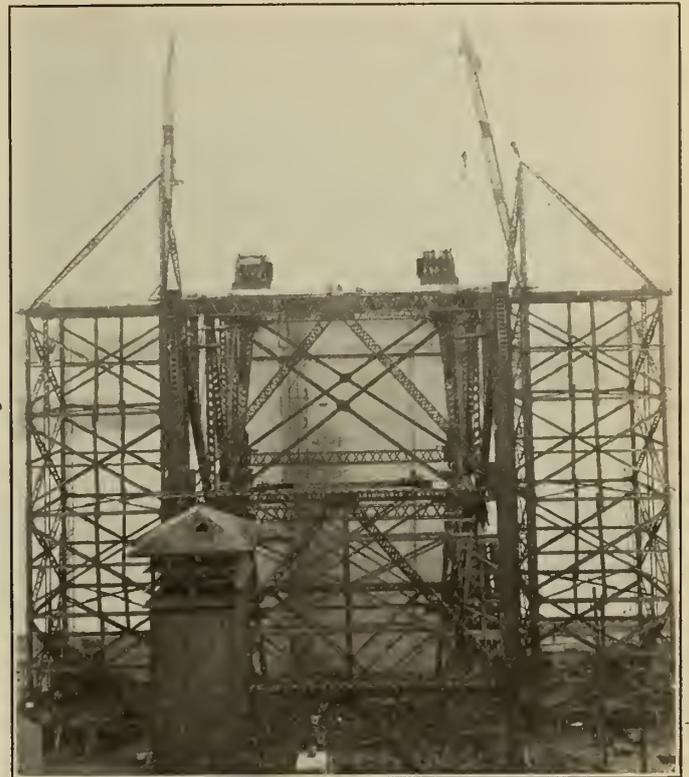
Main Span, North Side—General Arrangement of Falsework and Travellers Nos. 5 and 6.
